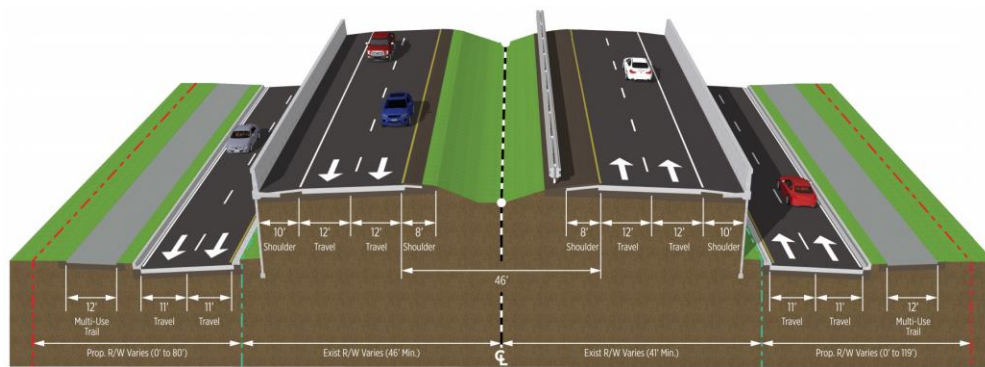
Segment 1 – Typical Section 1 from 4th Street to Brighton Bay Blvd.
